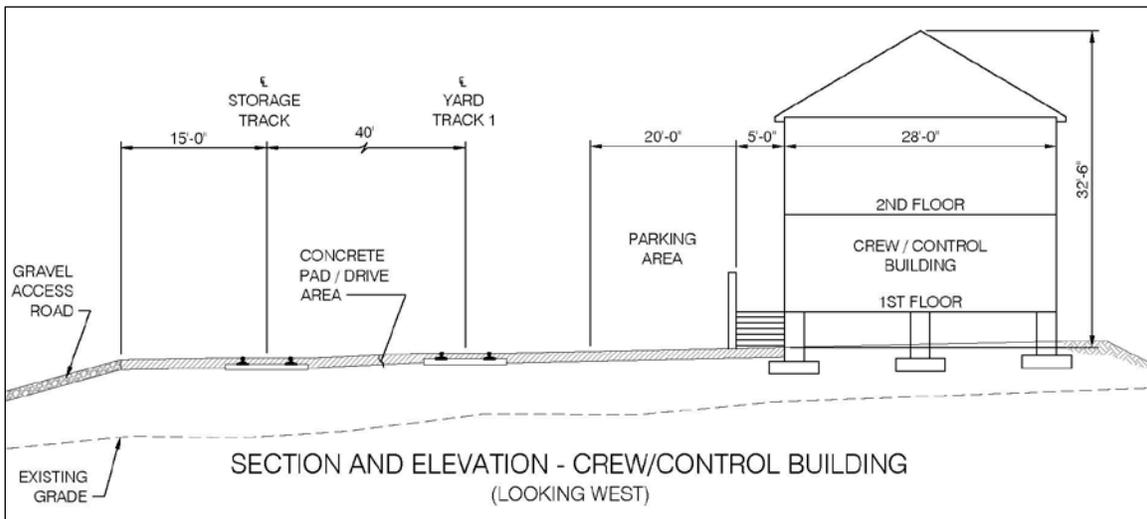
Elevation view of a possible configuration for the control facilities and crew building.
